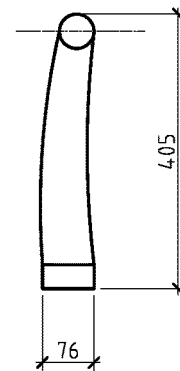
Mountable Grates for Precast Headwalls 255mm to 450mm Culverts
